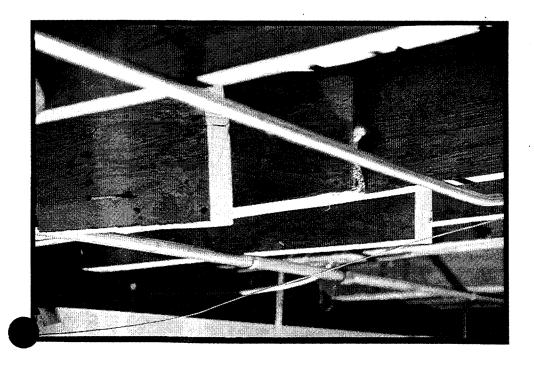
JOISTS AT THE SOUTHWEST PORCH
